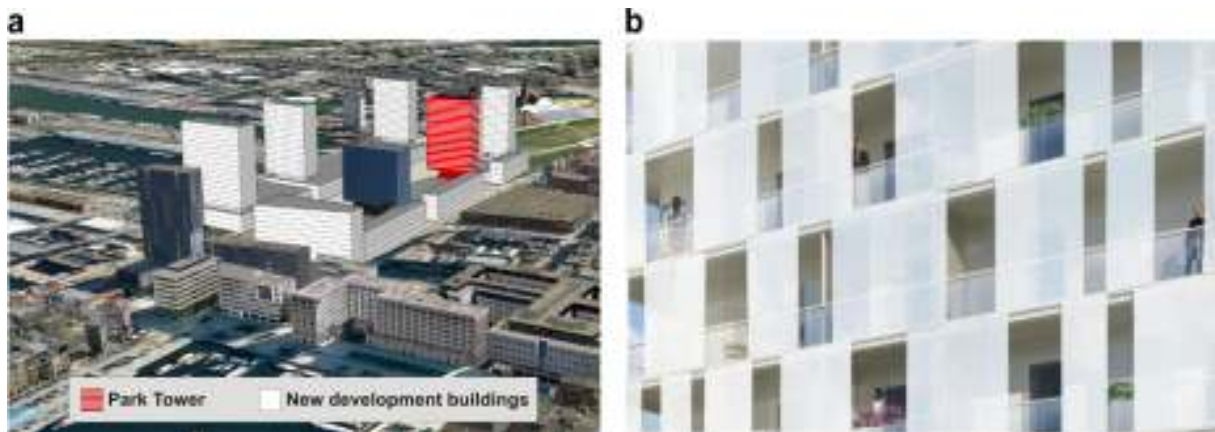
(a) View of Park Tower (red), other new buildings under development (white) and already existing urban surroundings; (b) Building facade with second-skin staggered facade concept.
